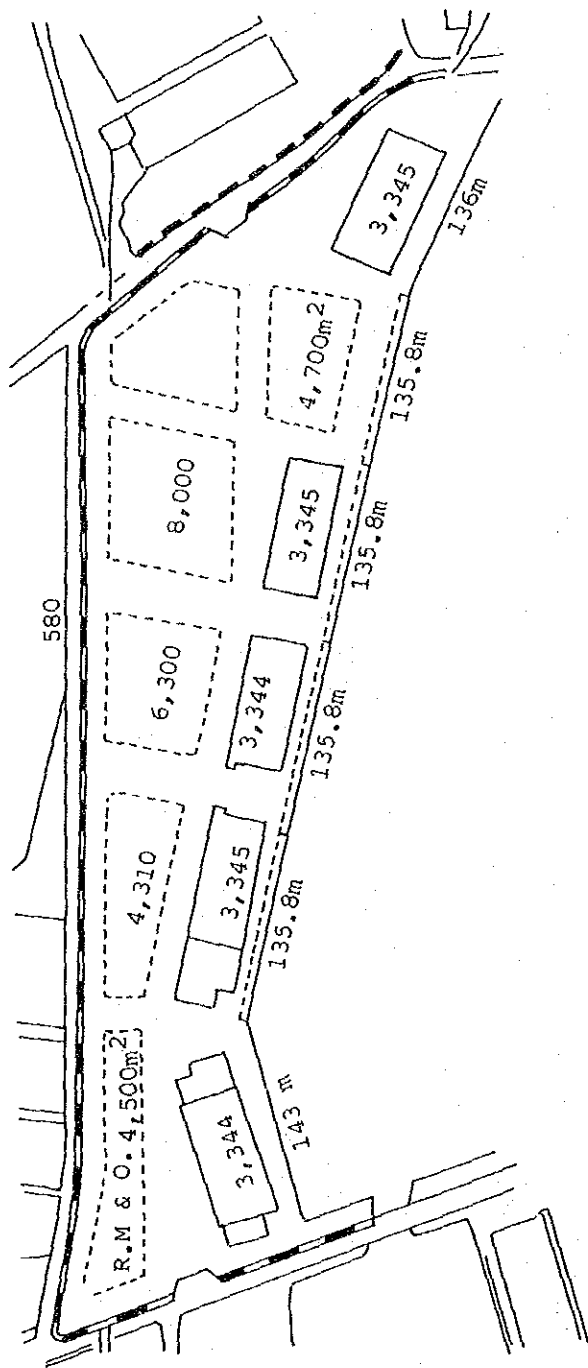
Improvement Plan of West Side of KPD1 in 2004/05
